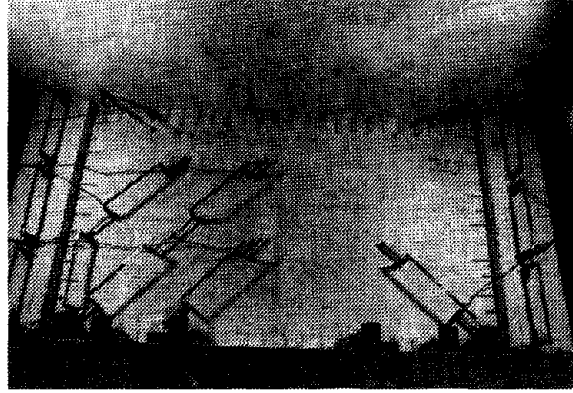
Dowels for Repair of First-Story Panel in Framed Wall Specimen
